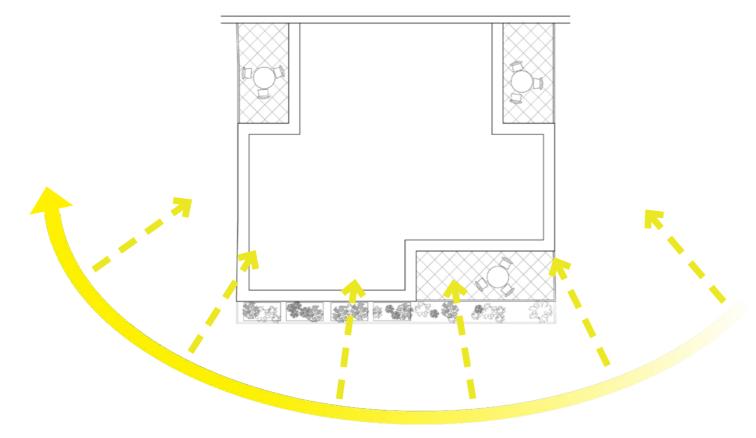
SOUTH FACING EXTERNAL AMENITY SPACES WITH PLENTY OF SUNLIGHT
